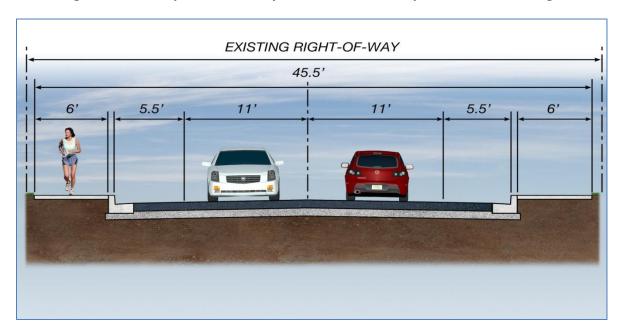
Proposed Roadway Section East of Proposed Movable Bridge
